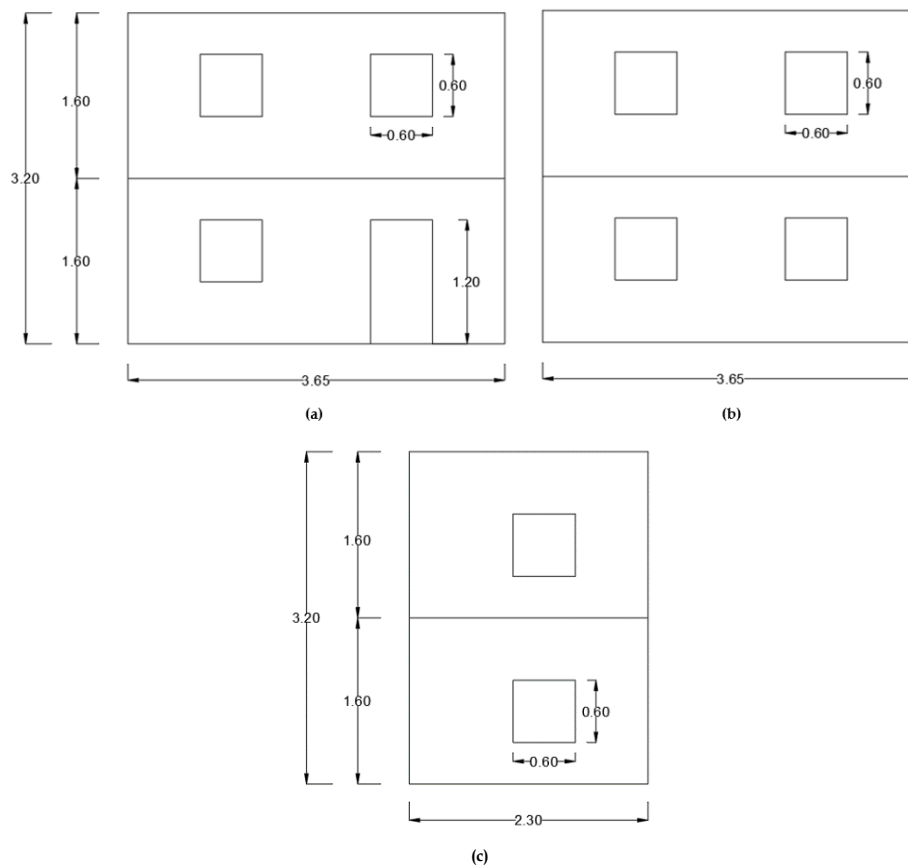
Elevations of the tested specimen: (a) front facade, (b) back facade and (c) side facades.
